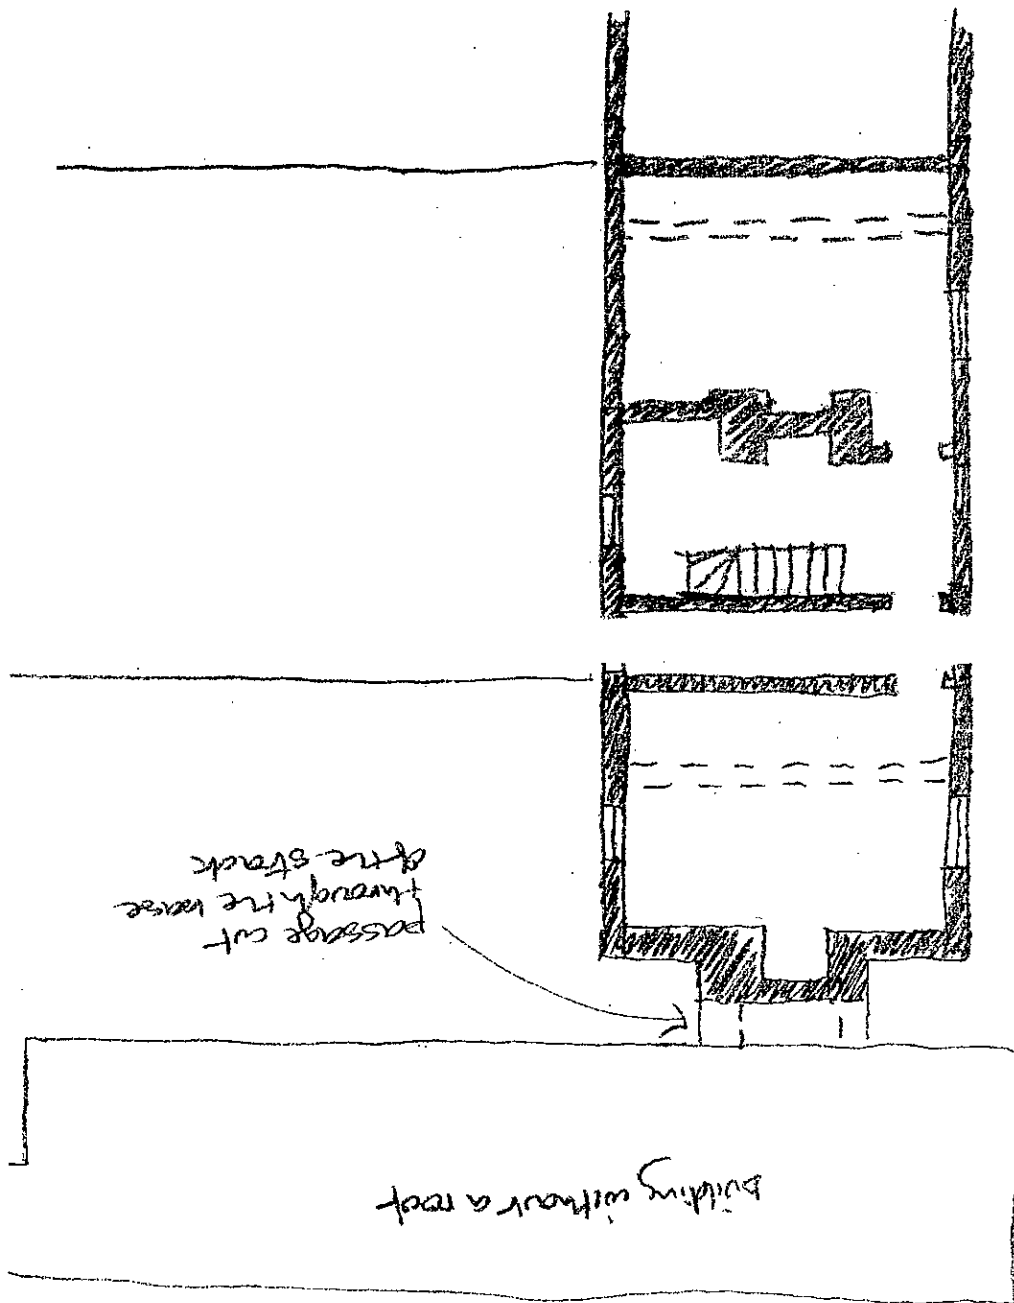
; sketch reconstruction of the eighteenth-century attic floor plan.
